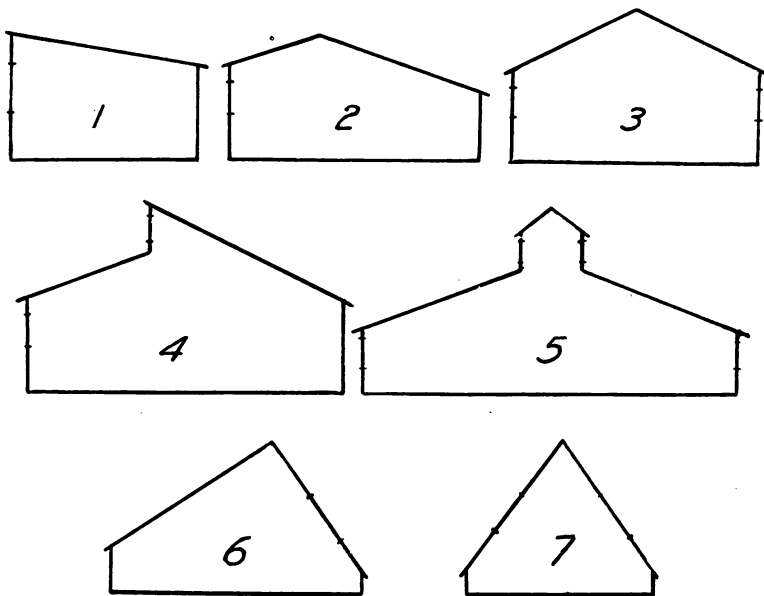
Different types of roofs used in poultry houses are here shown. 1 is a shed roof; 2 a combination roof; 3 a gable roof; 4 a semi-monitor roof; 5 a monitor roof; 6 a slanting front roof; and 7 and A type roof.
